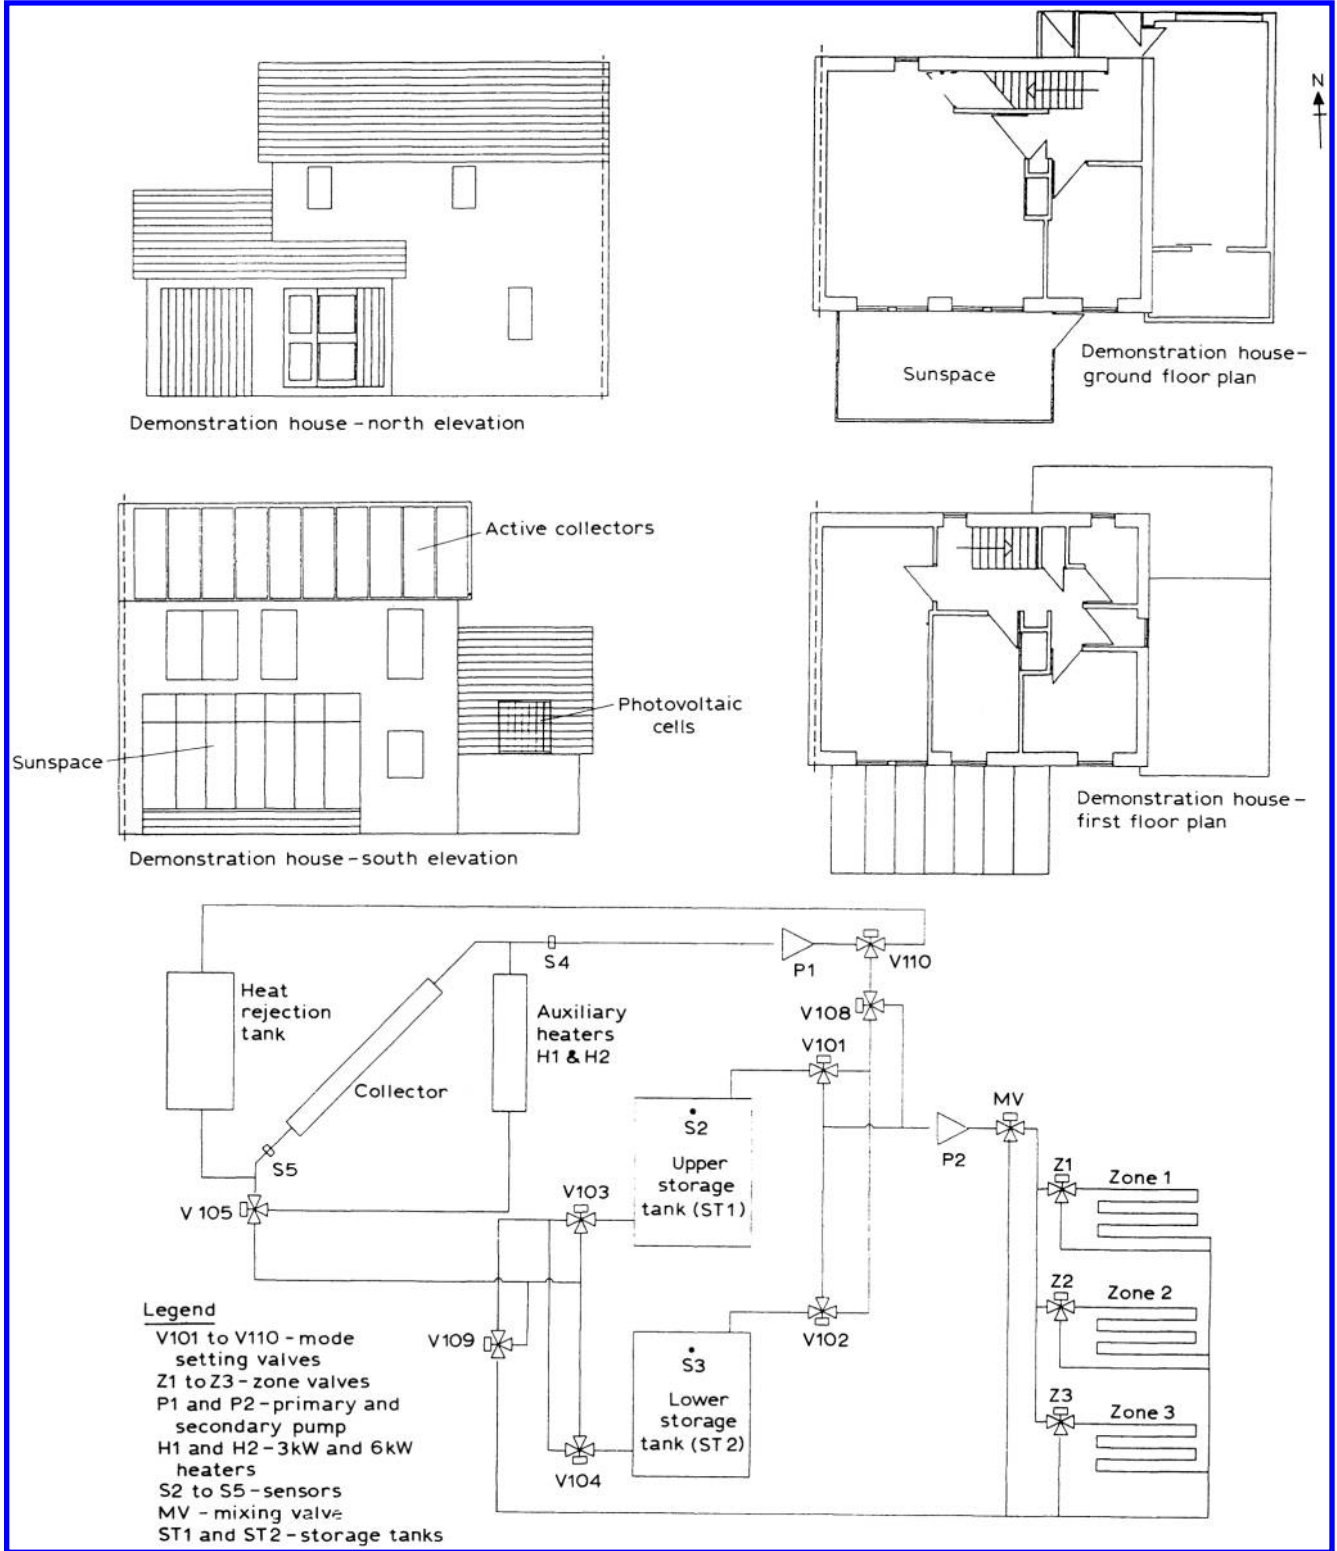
The Demonstration House: plans, elevations, and a diagram of the space-heating system.¹⁹ (Reproduced by permission of Franklin Consultants, Birmingham, UK.)
